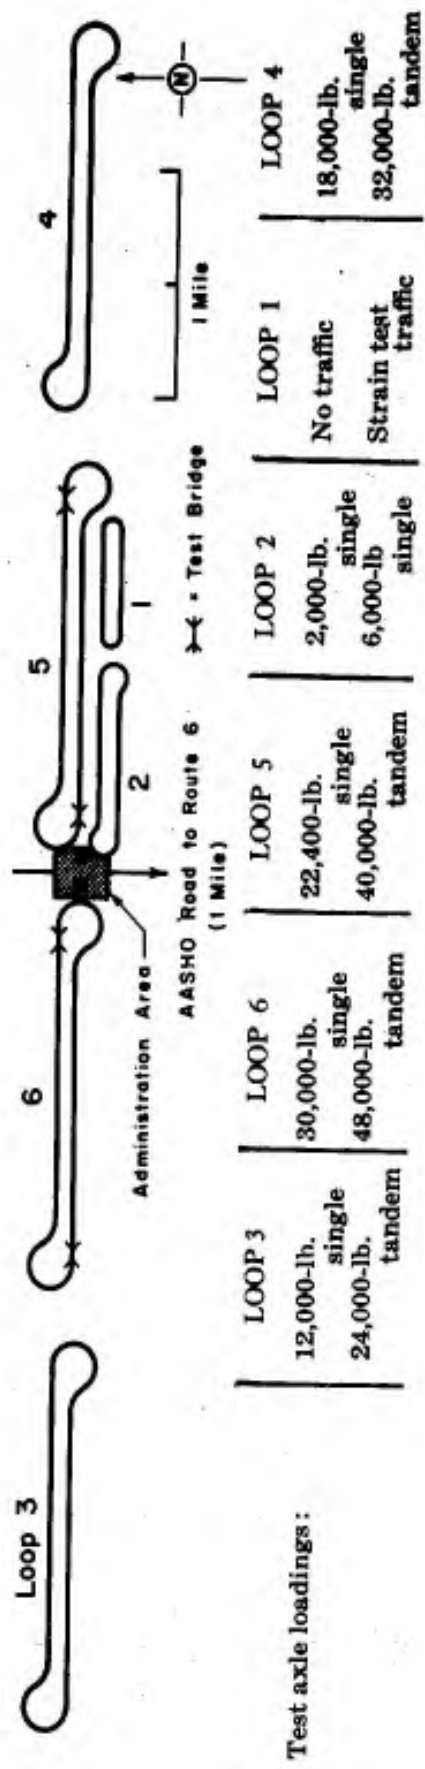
Physical Layout of the AASHO Road Test Project Driving Loops. (Source: AASHO Road Test Highway Research Board Pamphlet, Sept., 1958.)
